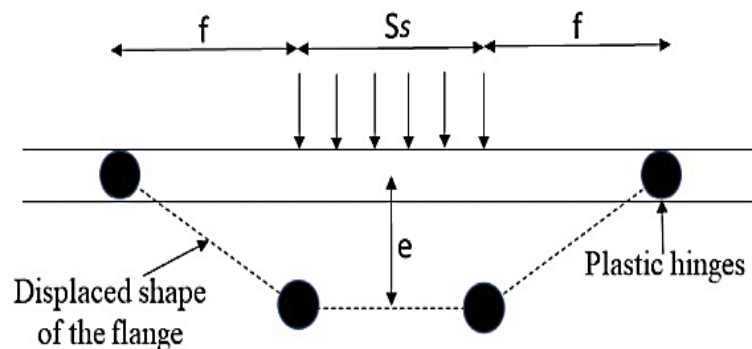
Flange mechanism for patch loading failure (Rockey and Roberts)
